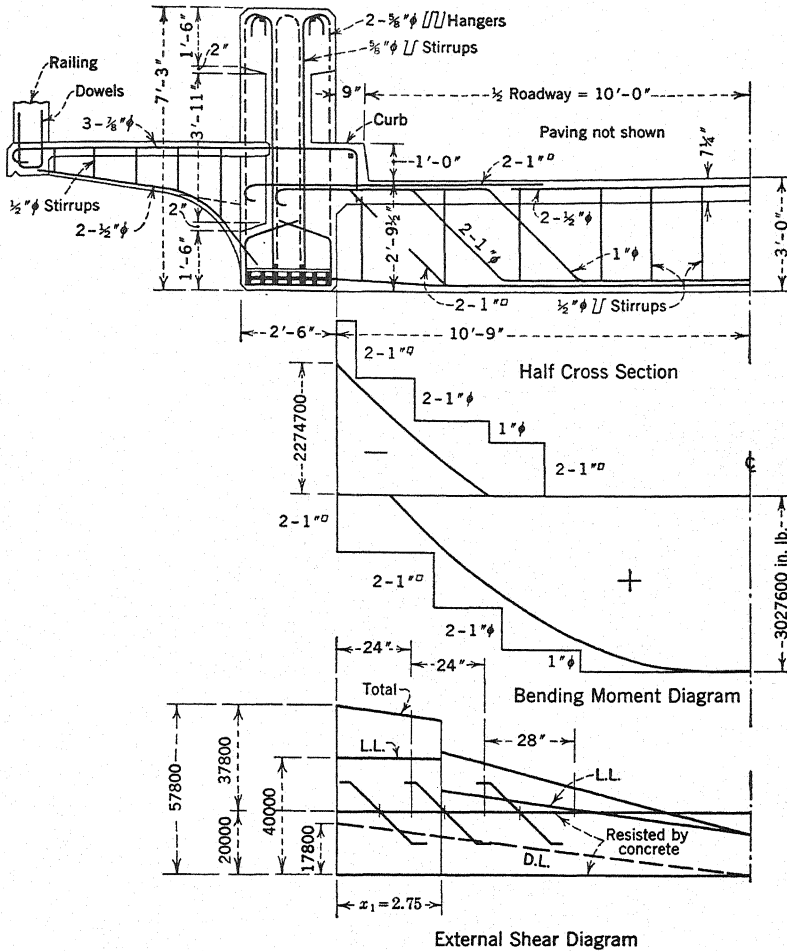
Cross Section of Through Bridge. Design of Floor Beam. (See p. 100.)
